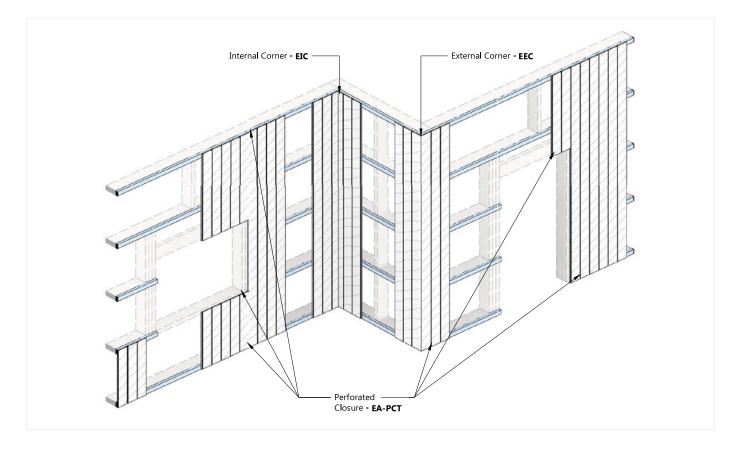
BATTEN LAYOUT AROUND AN OPENING
